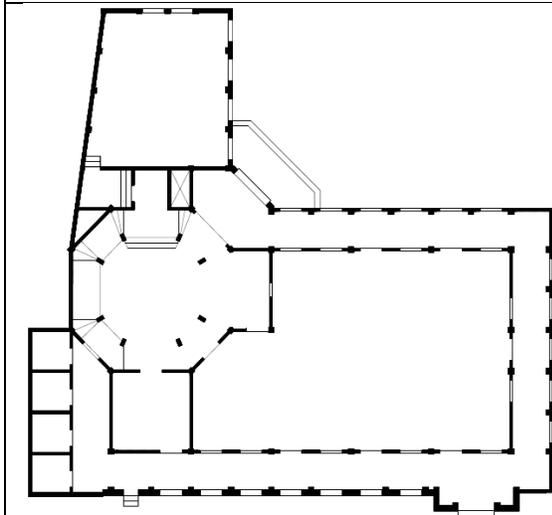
The typical sitemap of the 1st and 2nd floor of Jiwasraya Insurance office building. The corridor is seen to surround the main office room and the row of doors and windows to serve as the lighting system and cross ventilation inside the building. Source: private documentation.
